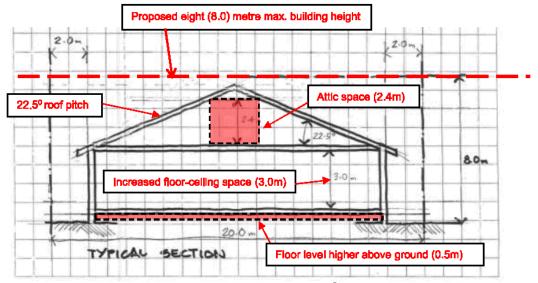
Eight (8.0) metre maximum building height & 22.5° roof pltch – enables an increased ceiling height, a 2.4m floor-ceiling loft and an elevated floor level.
